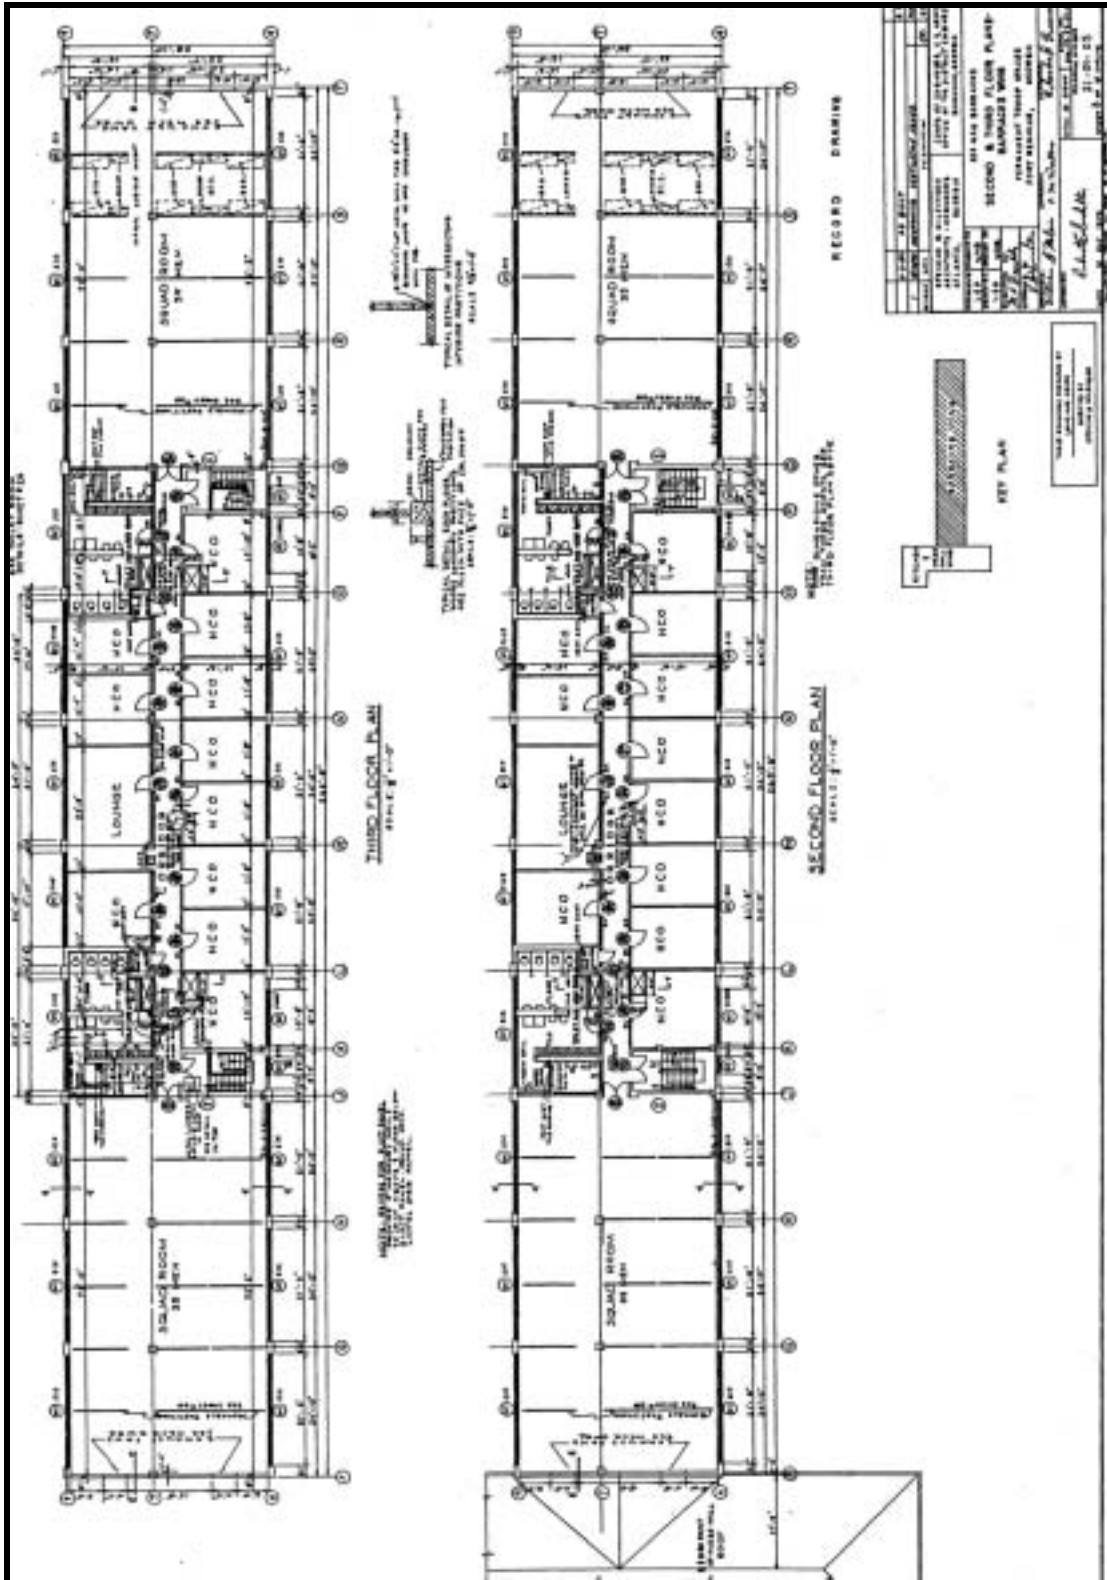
225-man hammerhead barracks, floor plan, barracks wing, 2nd and 3rd floors (ca. 1951, revised 1968) (Engineering, Ft. Benning).
